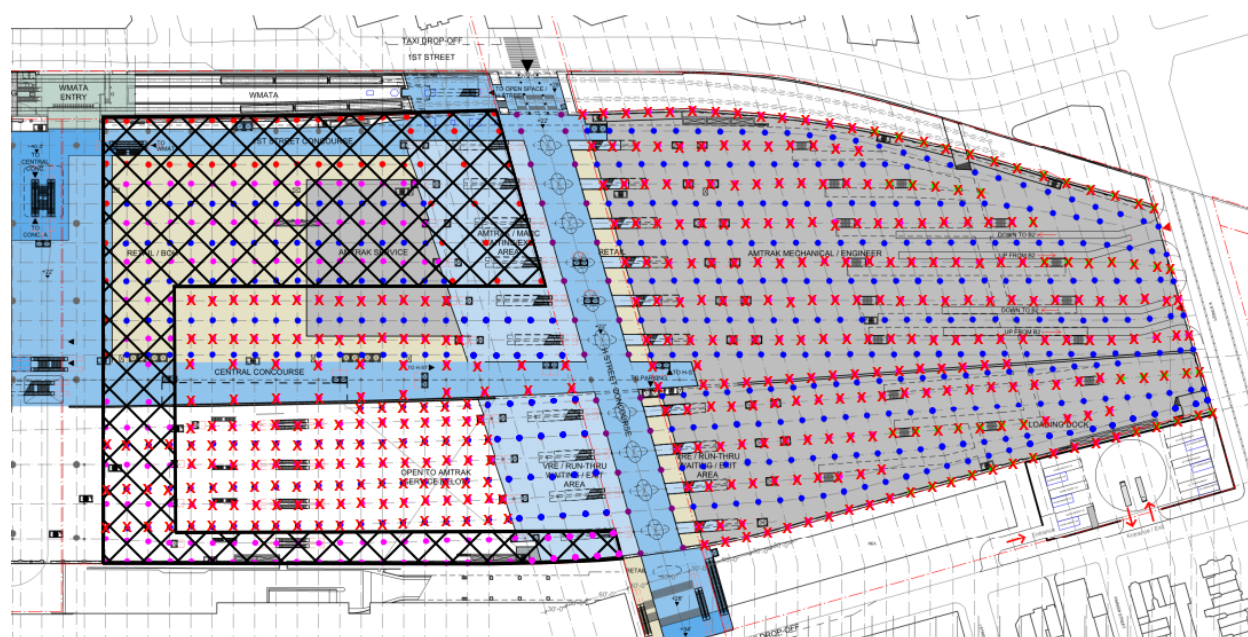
1 – ALT A-C Air Rights Removed Column Layout
